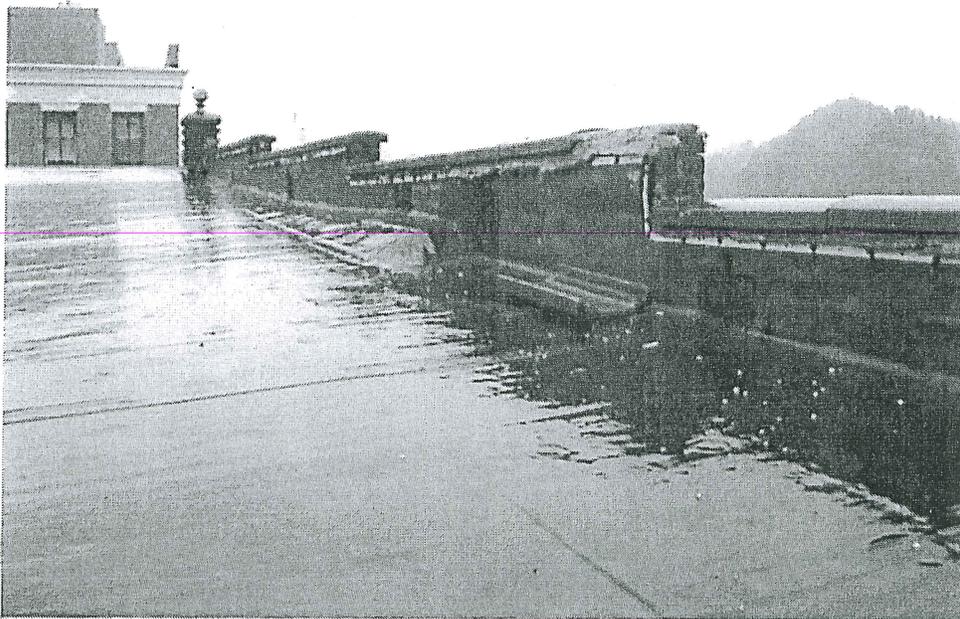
Damage to the coping and parapet, looking northeast
